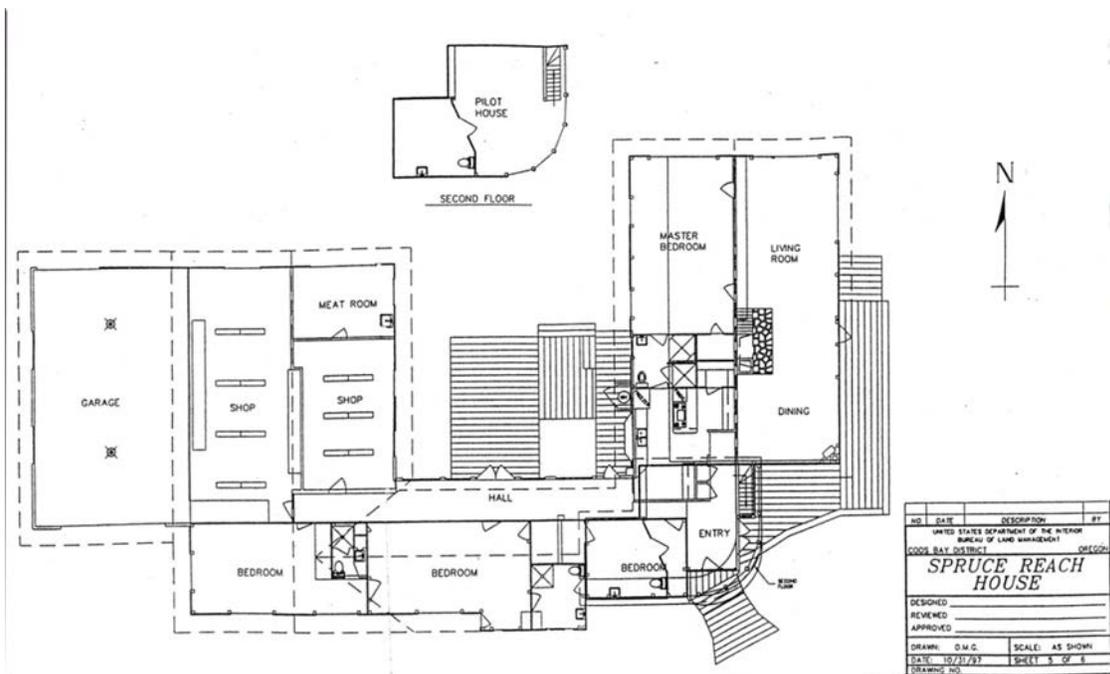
Floor plan of the Spruce Reach house (OTAK 1998).
